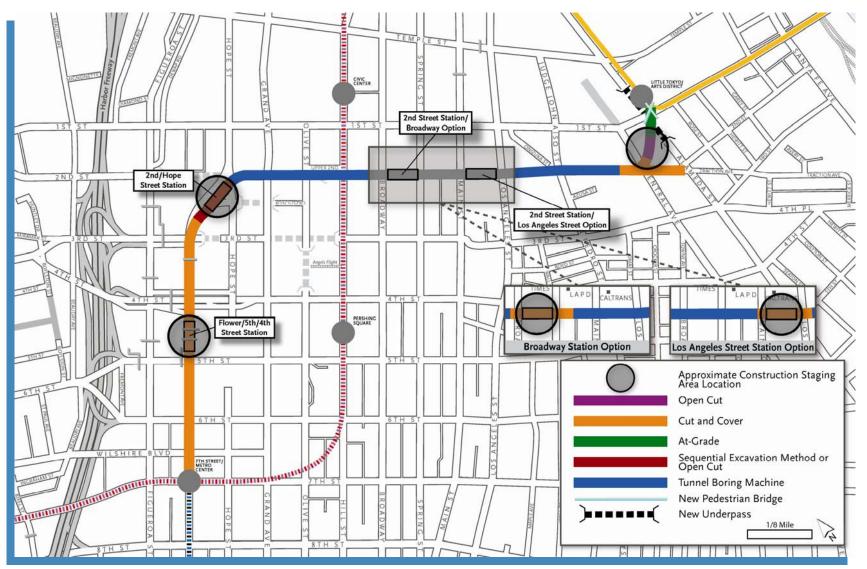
Underground Emphasis LRT Alternative Construction Areas and Methods
